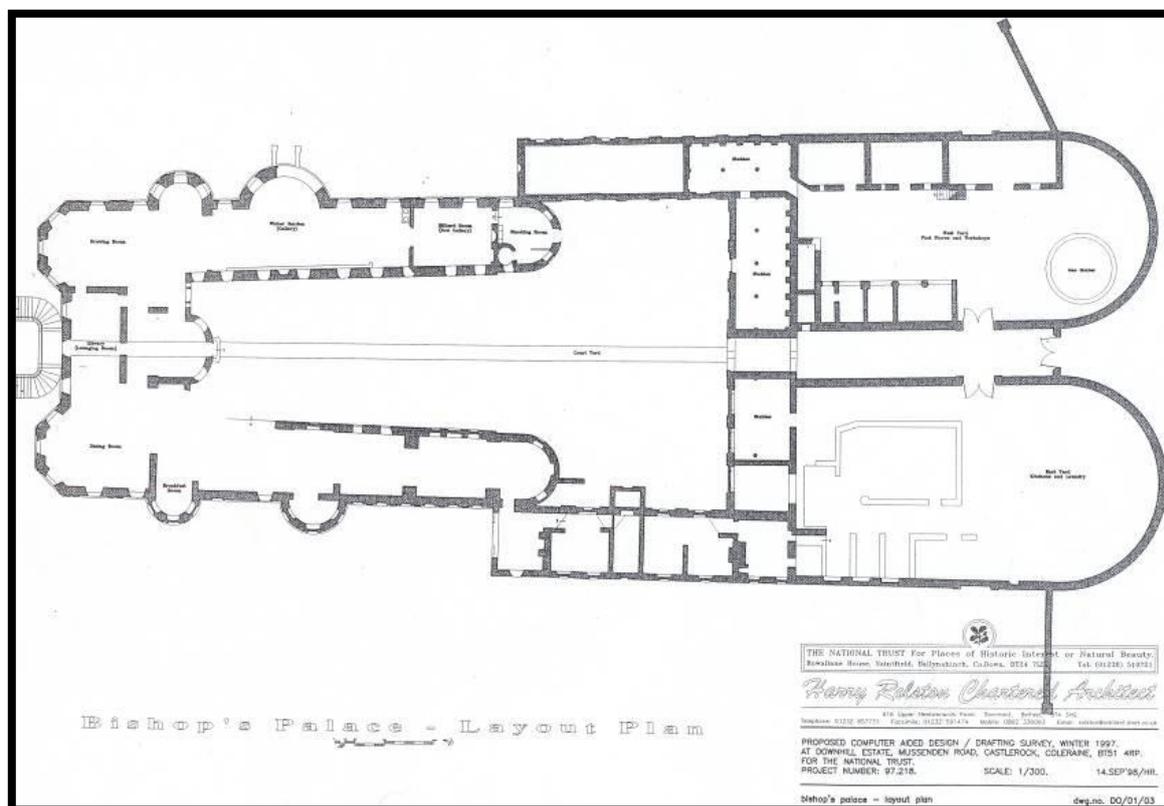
Layout Plan of Bishop's Palace, Downhill, County Londonderry, *National Trust
